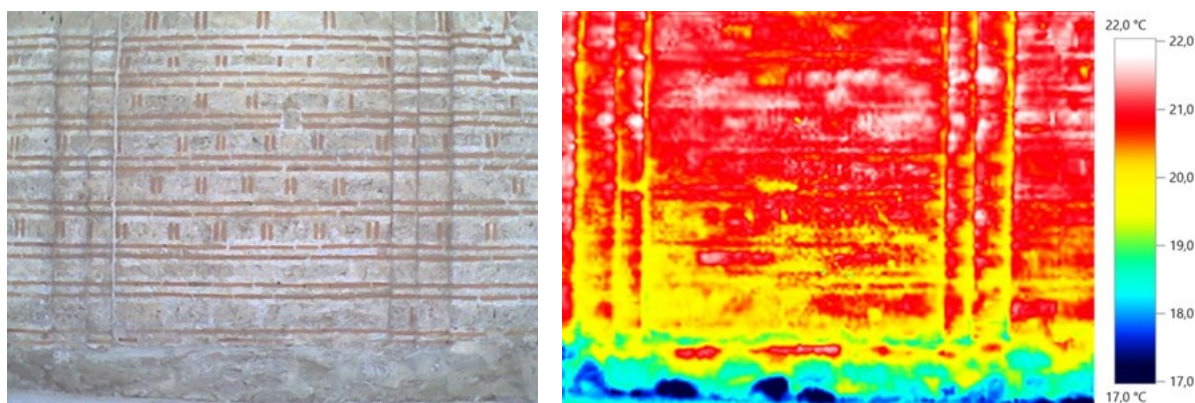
Segment of the north facade wall of St. Nikita church and corresponding thermal image
